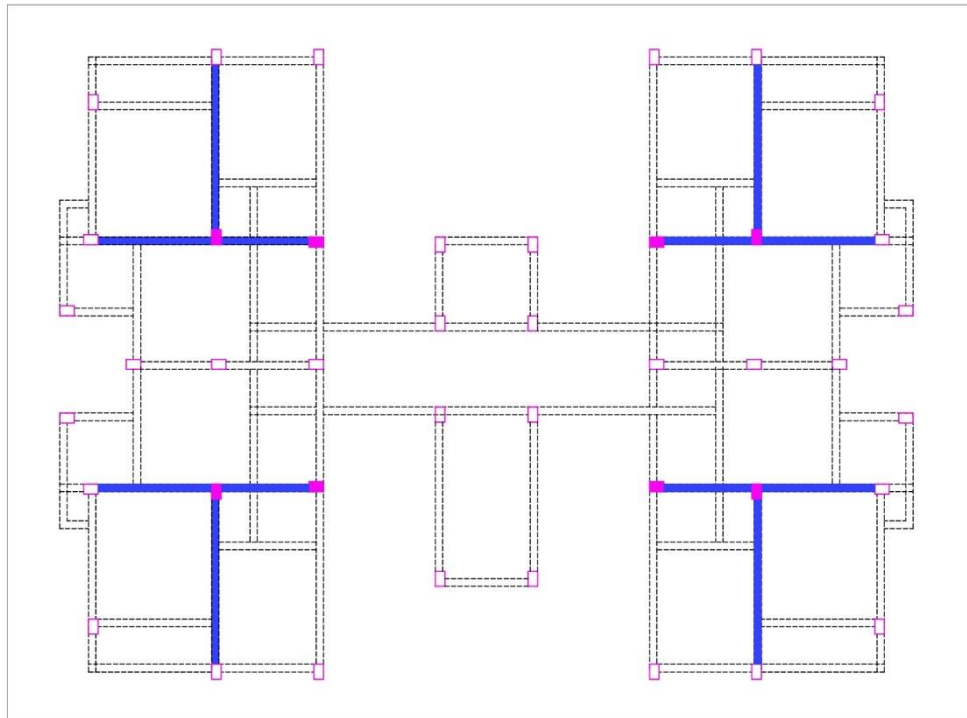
Model 3 – Plan highlighting the columns and beams jacketed
